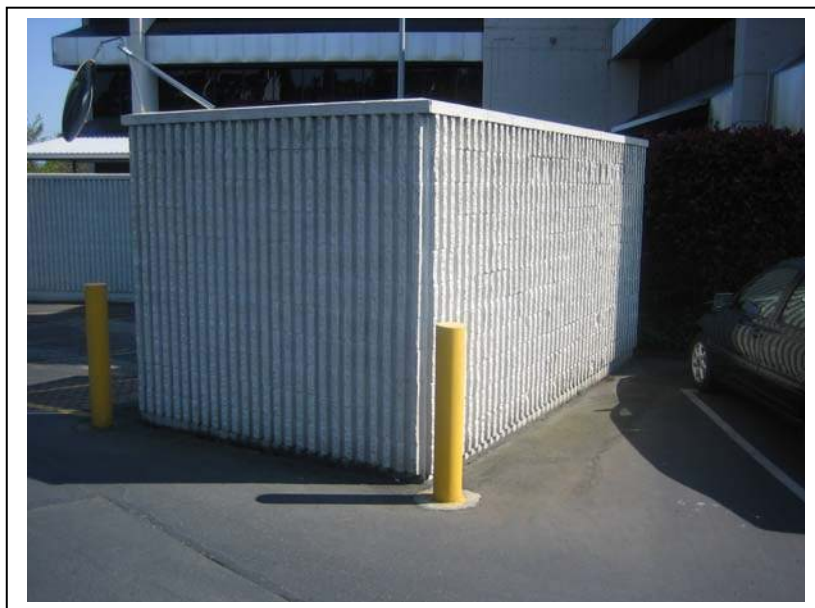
Concrete wall crack at Exterior of Elevator.
